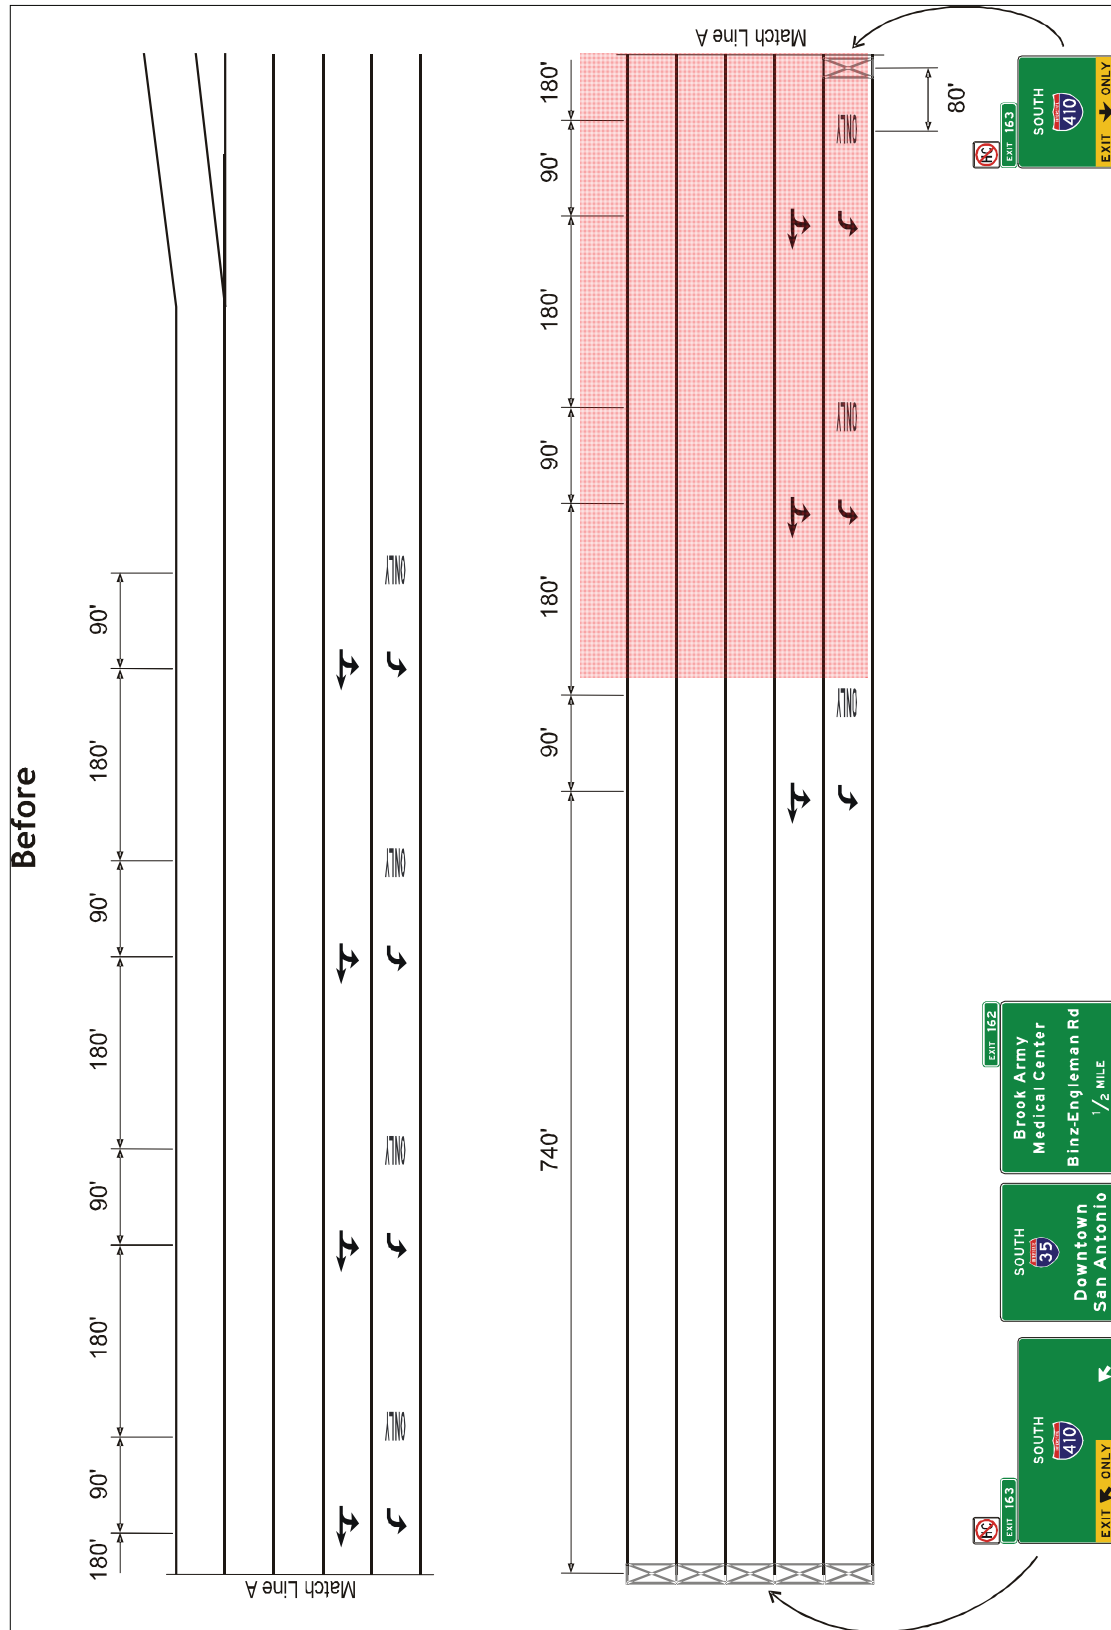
Pavement Marking Plan prior to 10/12/2008.
